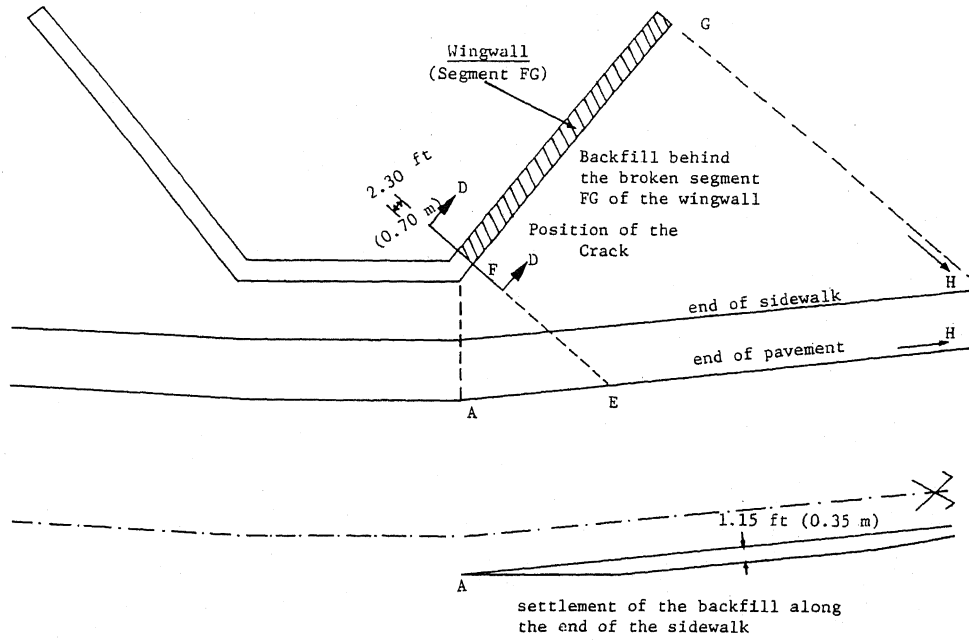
PLAN VIEW OF THE WINGWALL ILLUSTRATING THE POSITION OF THE CRACK AND THE DISTRIBUTION OF THE SETTLEMENT OF THE BACKFILL
